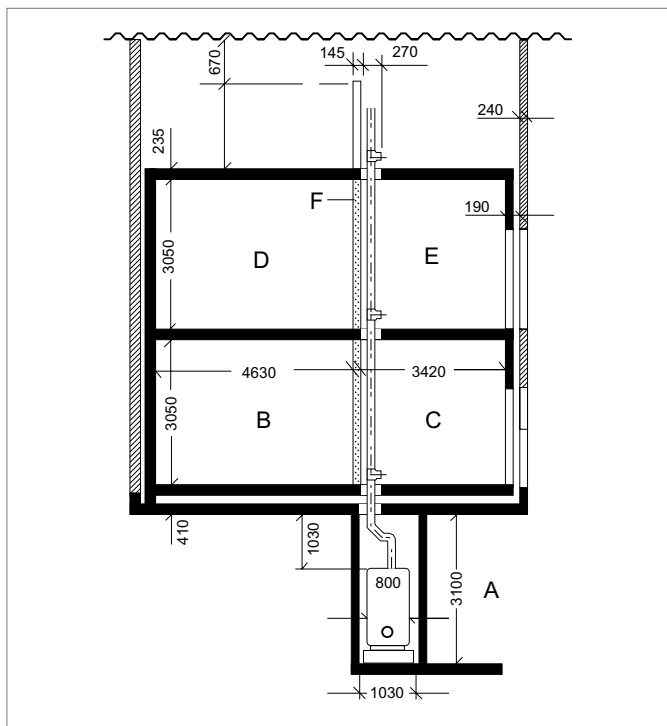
Installation set-up of the Fraunhofer Institute for Building Physics (all measurements in mm)
